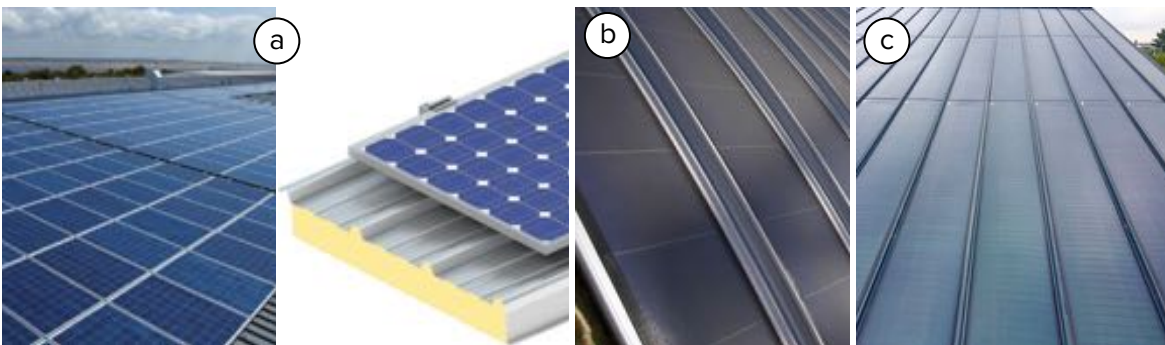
PV cladding for roofing systems: a) Kingspan rooftop solar PV system, b) Kalzip Aluplus Solar system, c) BIPVco system.
